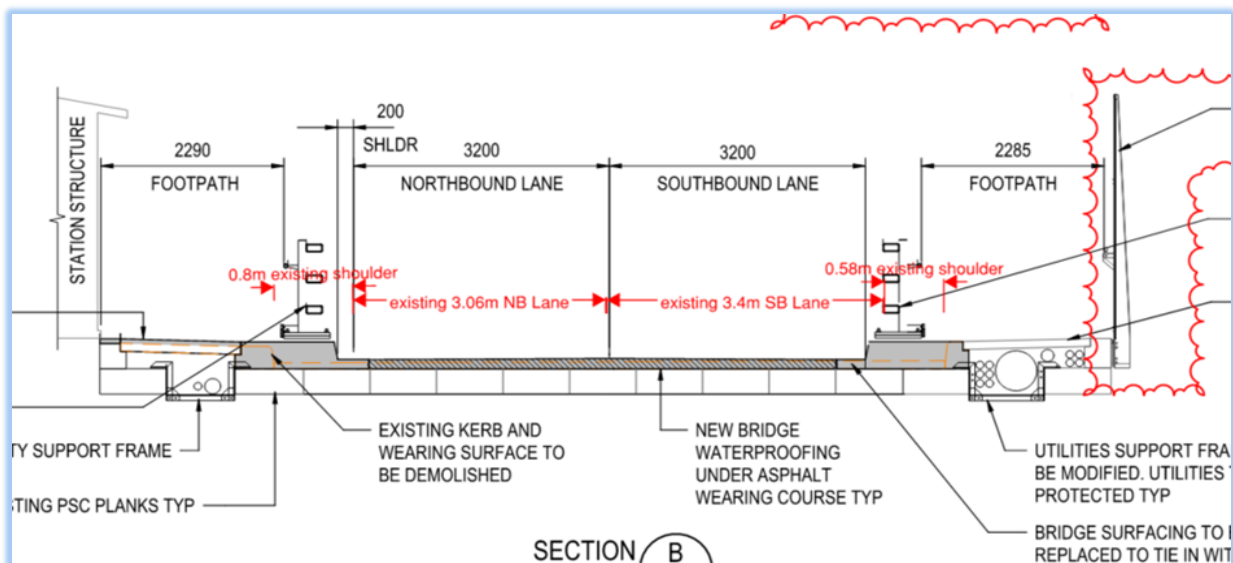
Cross section of the Wardell Road Railway Over-bridge in Dulwich Hill
